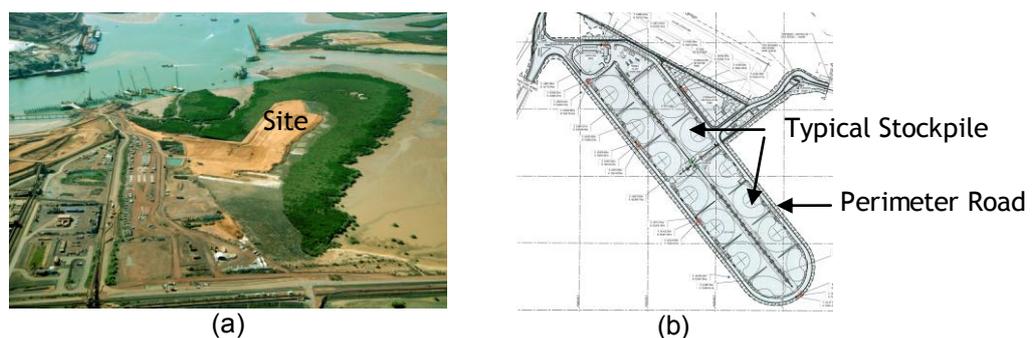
(a) Aerial Photograph of Site (b) Stockpile and Perimeter Road Arrangements
